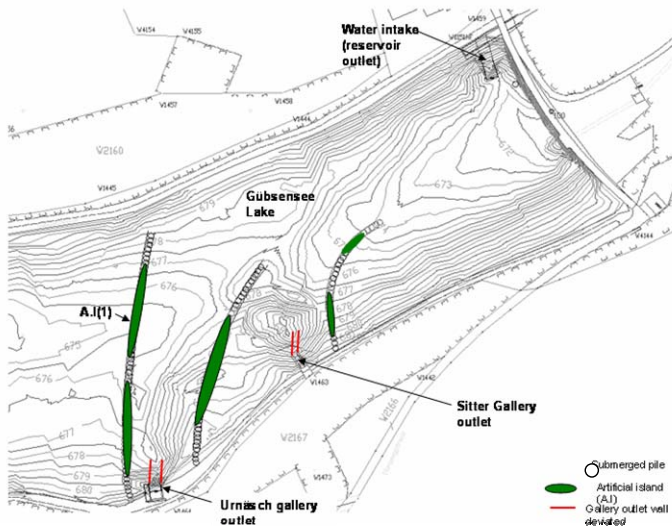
Details of the suggested measure with the geometric elements (artificial islands, submerged piles and deviated gallery outlet walls).
